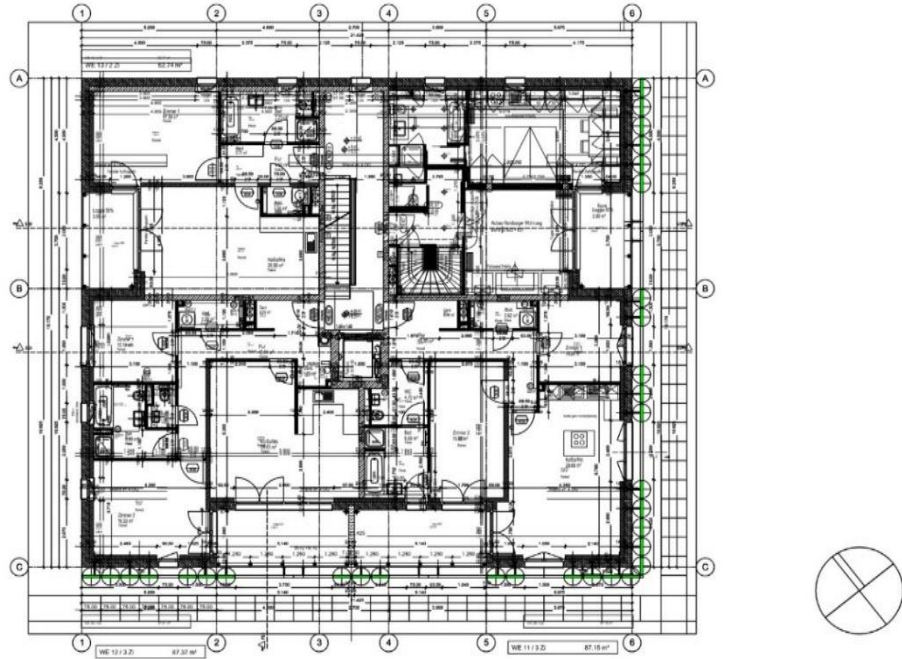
Plan of BIQ House (Ongreening, n.d.).
